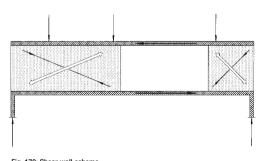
Shear wall scheme Beam consisting of two non-identical shear walls
